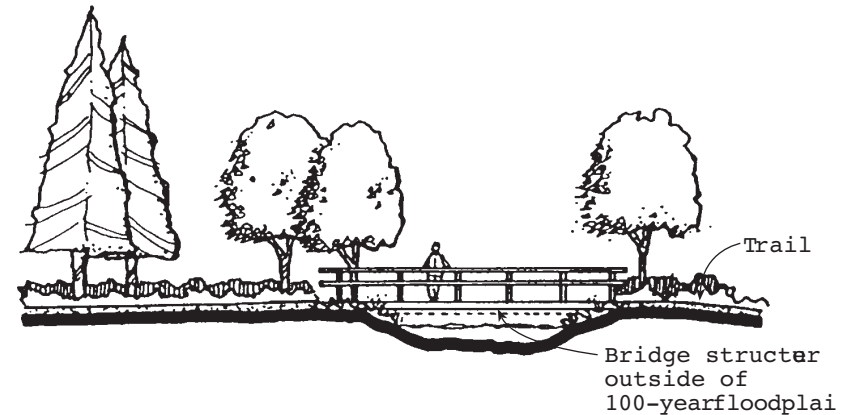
Locate footings outside of stream channel at top of bank (Trolley Trail Master Plan, Metro, 2003)
